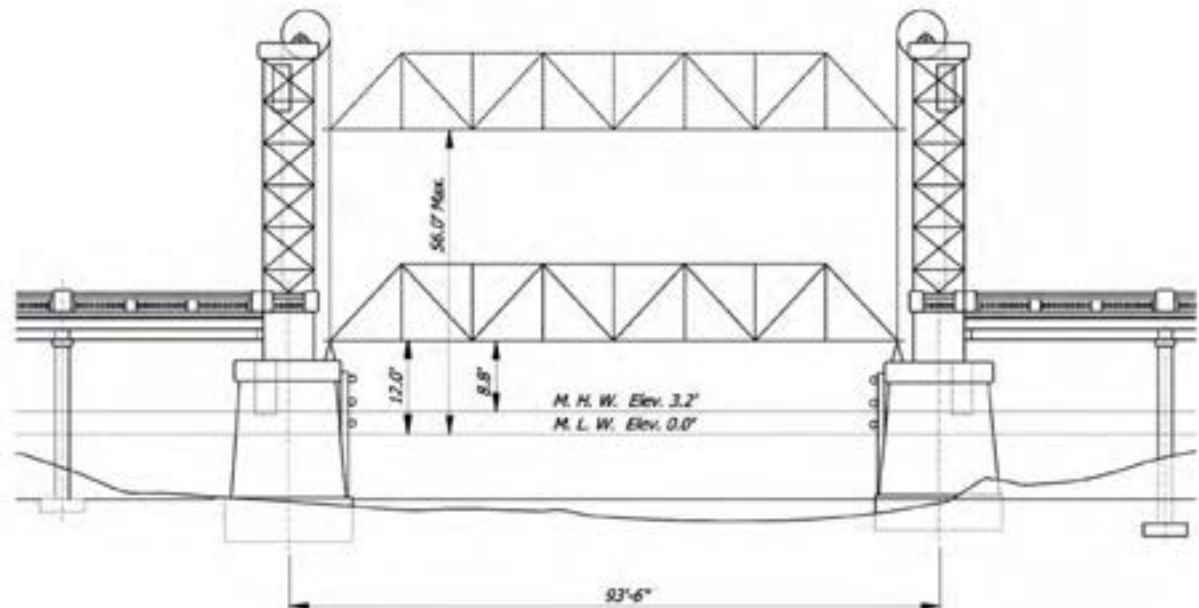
Bridge elevation view for a vertical lift bridge indicating vertical clearances. (Source: Florida DOT)
